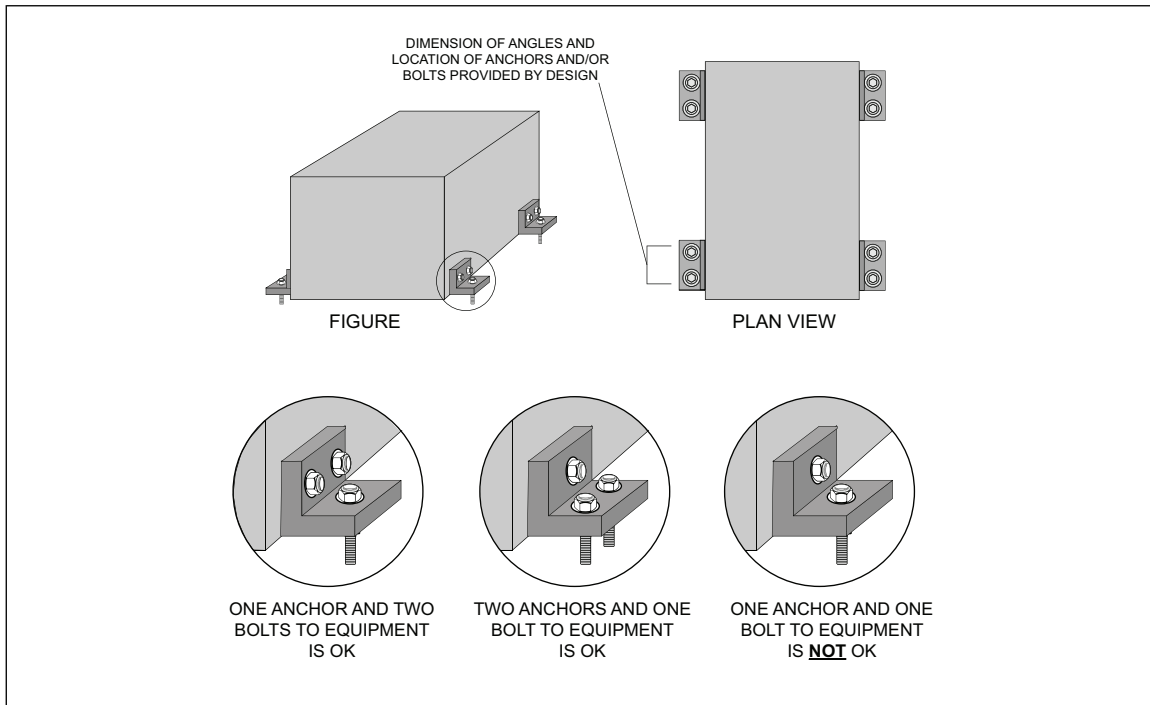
C. Example of equipment attached using additional steel structural angles to structural floor (Figure 73 from FEMA 412)
